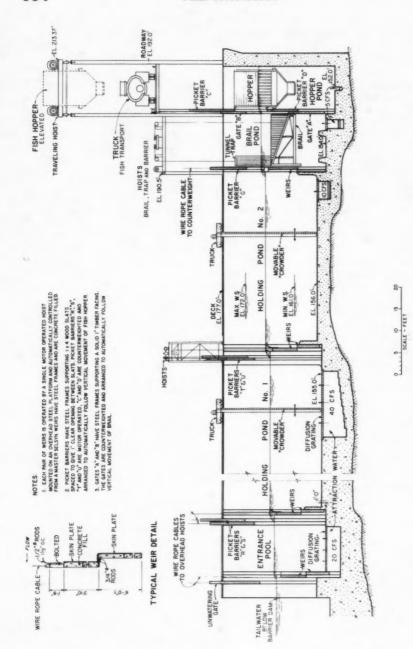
LONGITUDINAL SECTION THRU FISH TRAP
